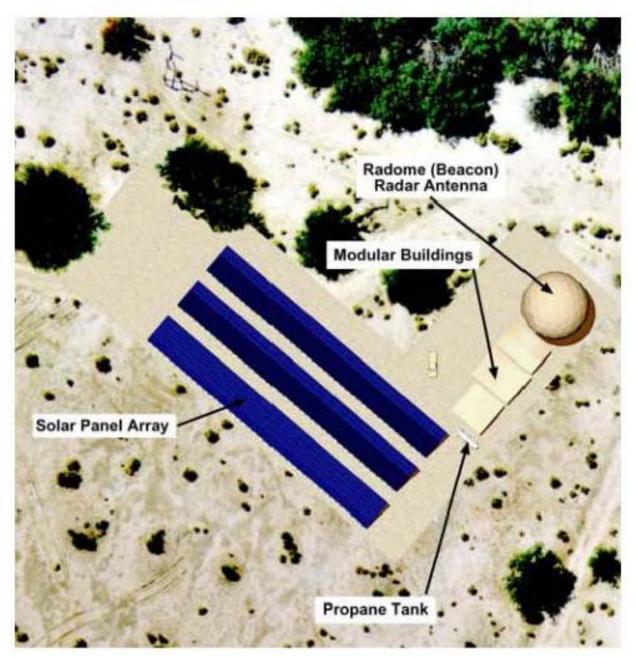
Conceptual Site Plan – Beacon Radar
